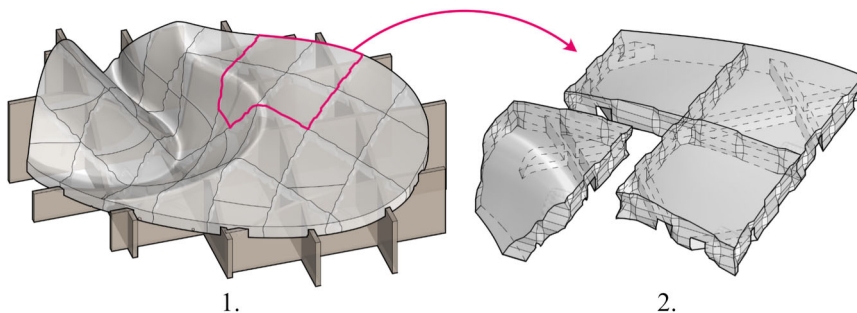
(1) Assembled mold on a wooden frame; (2) four modules prepared for 3D printing
